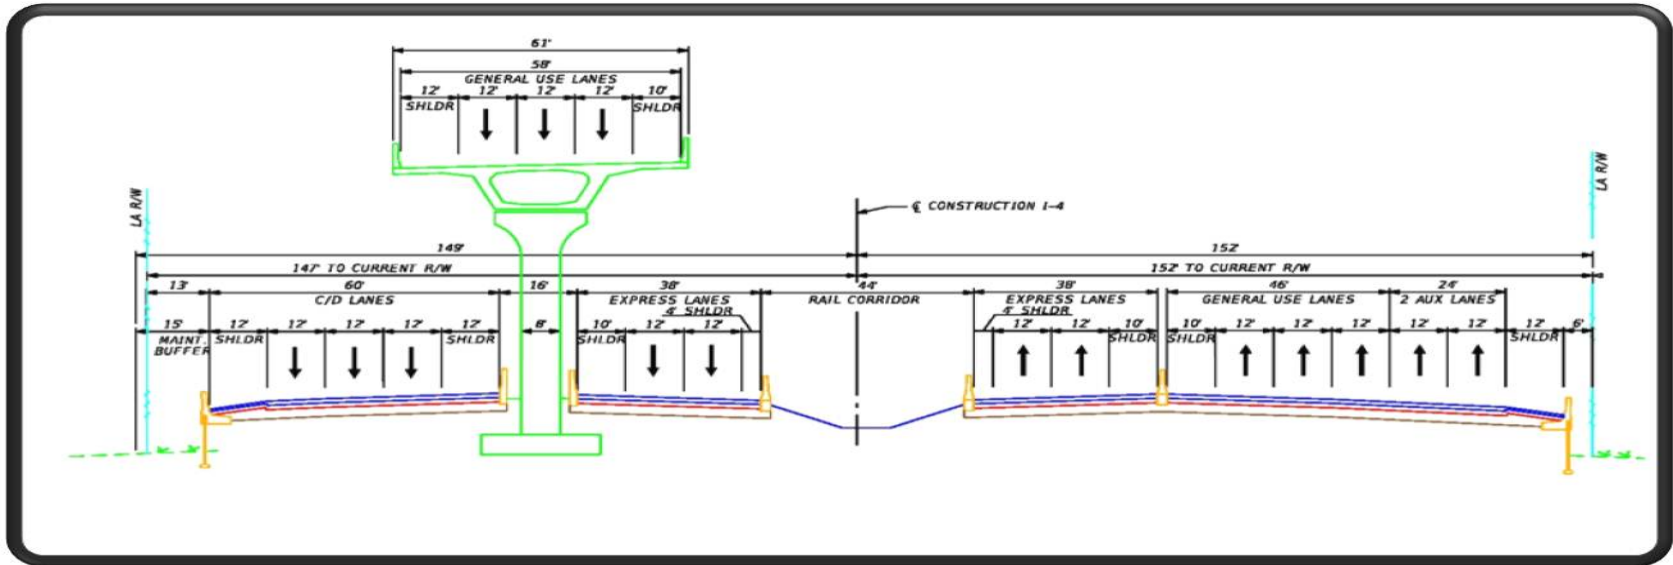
SR 400 (I-4) Segment 1 Proposed Typical Section (elevated WB GUL Lanes from SR 535 to Daryl Carter Parkway)
